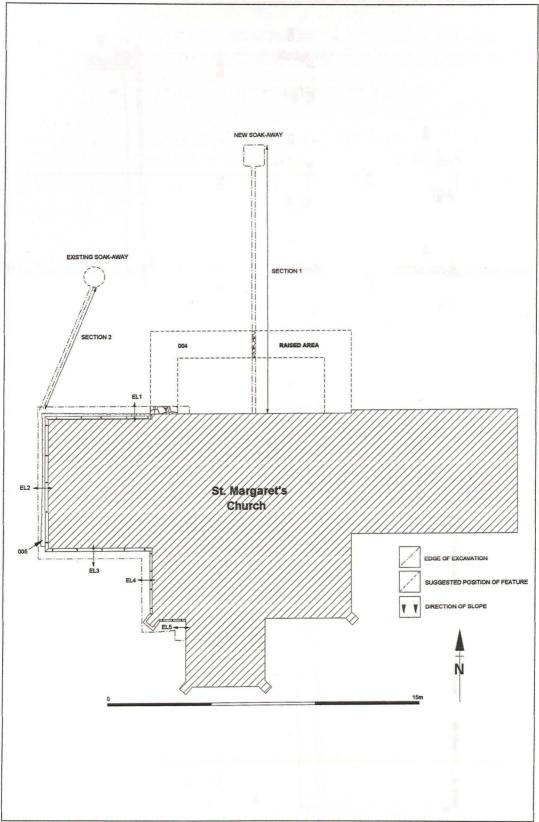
Plan showing location of areas investigated, sections & elevation locations (not to scale).
